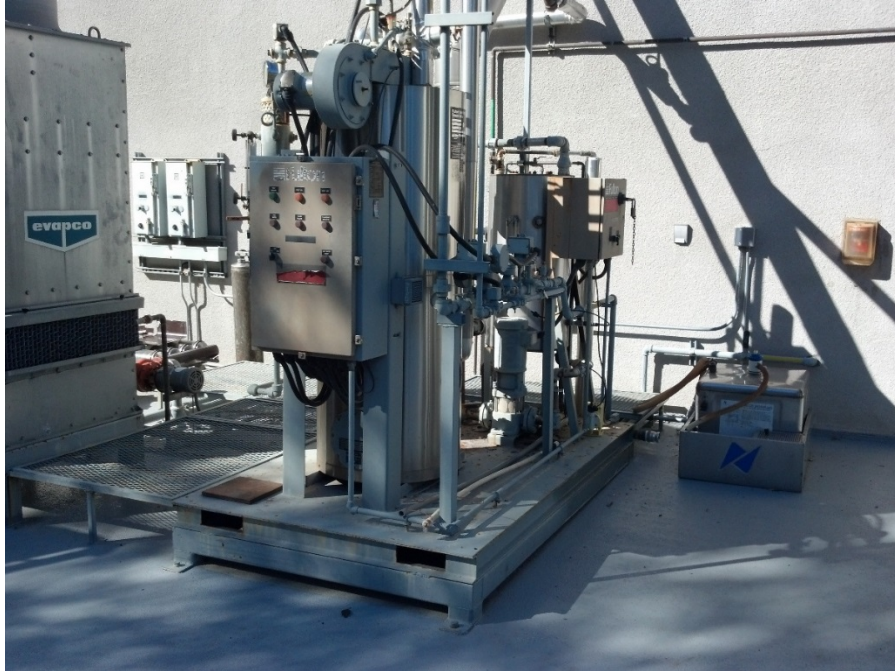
Fulton Steam Boiler and Evapco Cooling Tower
